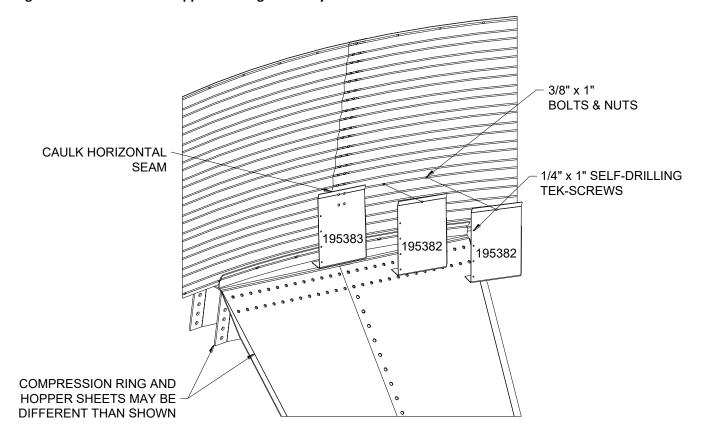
Connection Detail for 36' Upper Hopper Sheets
